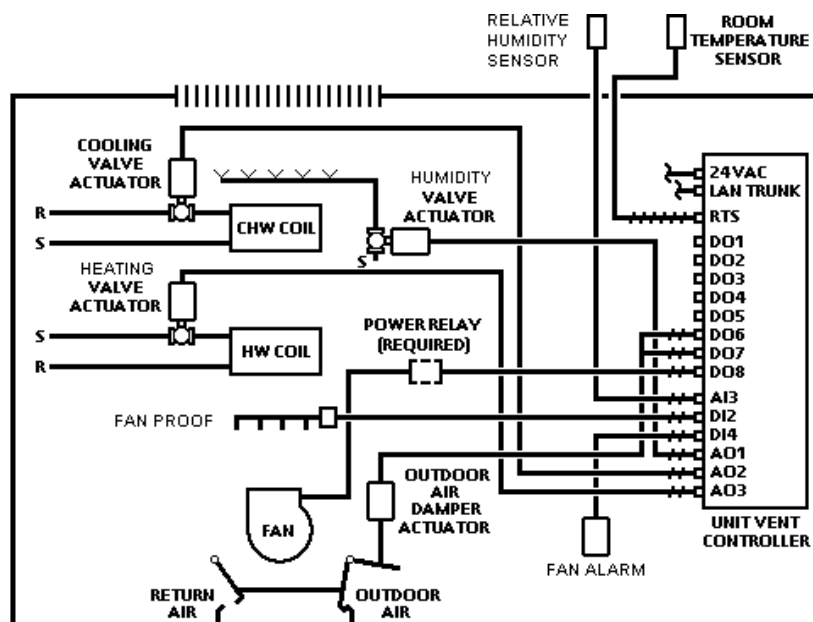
Application 2306 Control Drawing with Heating and Cooling Coils, 2-Position Damper, and Modulating Humidifier.
